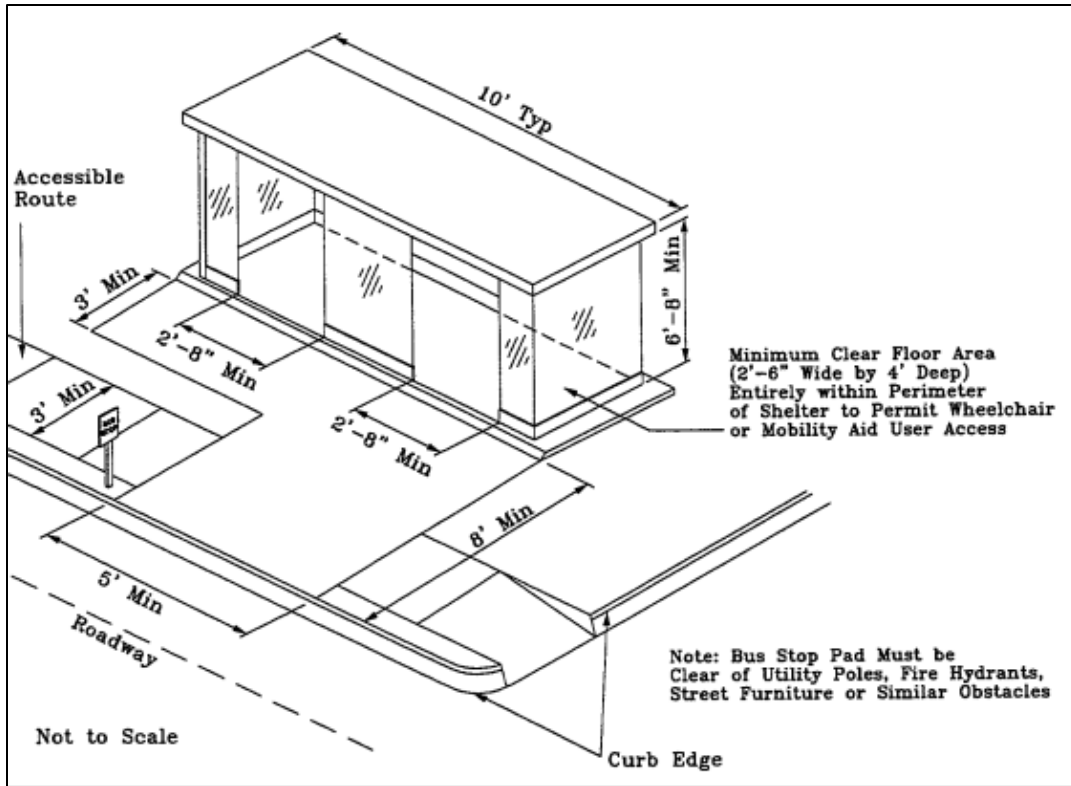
Accessible Bus Stop Pad and Shelter Minimum Dimensions
